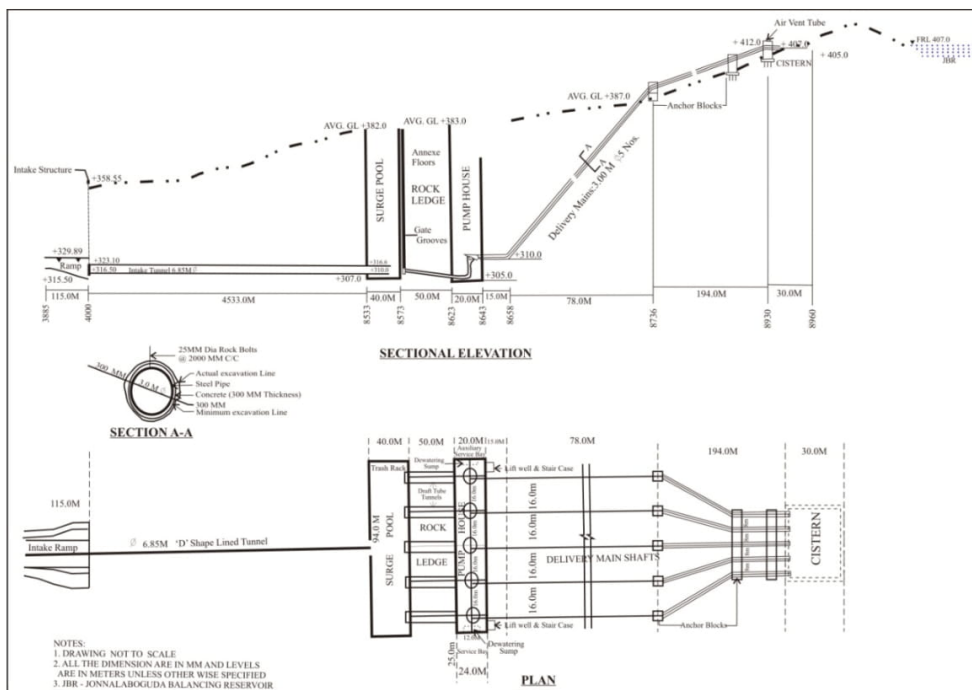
Plan and elevation of schematic drawing of MGKLIS-II
